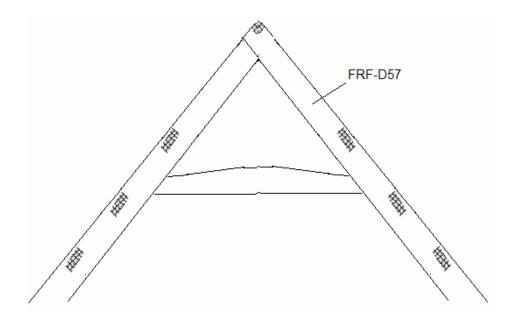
Connecting range; sketch of truss 8, showing the location of sample FRF-D57
